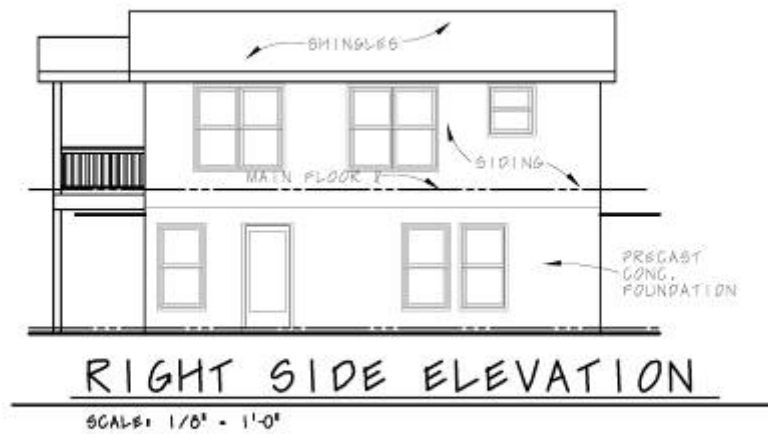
South elevation of ZEH4 with most of the windows provides good daylighting. It would be good to add some shading for the bottom floor windows.
